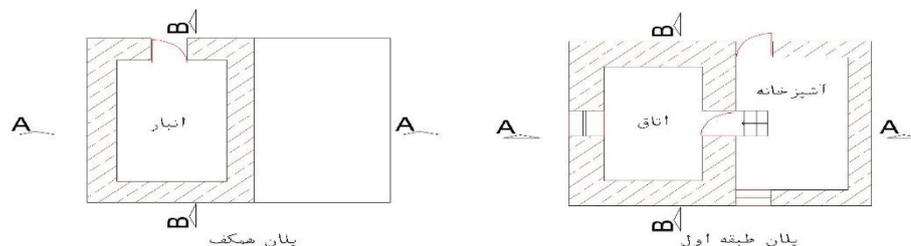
ground and first floor plan of the third sample of rural house, (authors)
